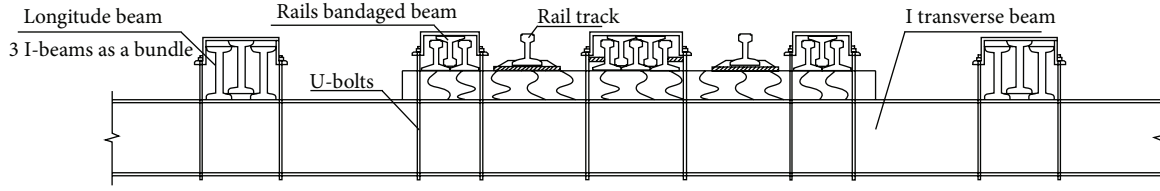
Section scheme of railway reinforced system with cross-beams.
